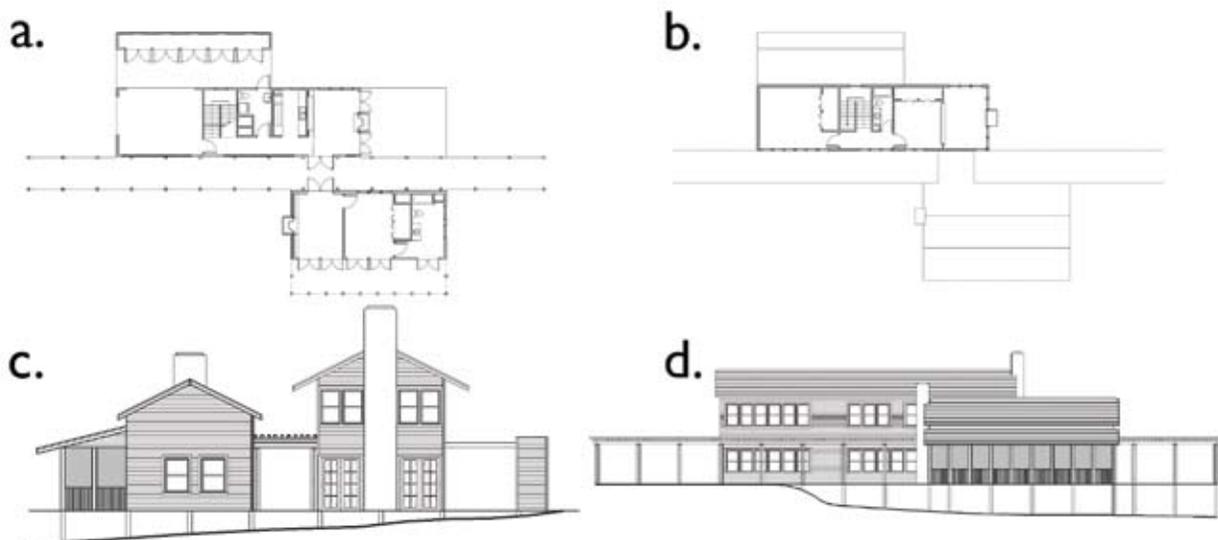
a) Ground floor; b) Second floor; c) East Elevation; d) South Elevation
